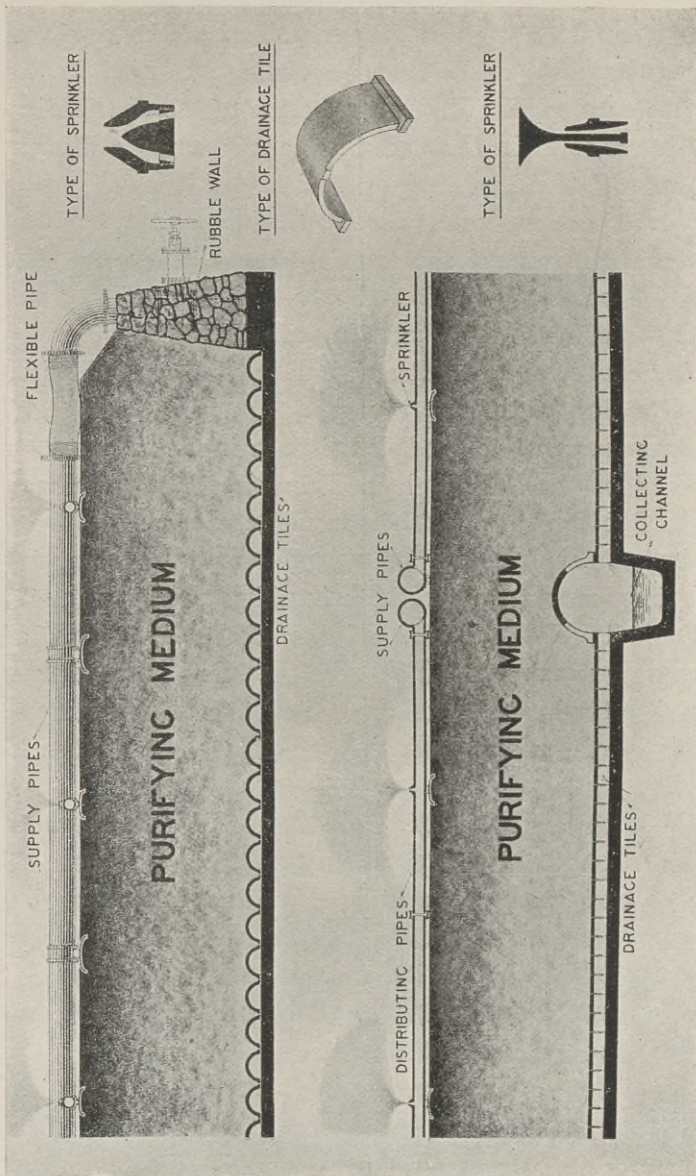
Sections of Percolating Filters at Birmingham, Showing General Arrangement of Fixed Distributors and Under-drains, also Alternative Types of Sprinkler Nozzles.
